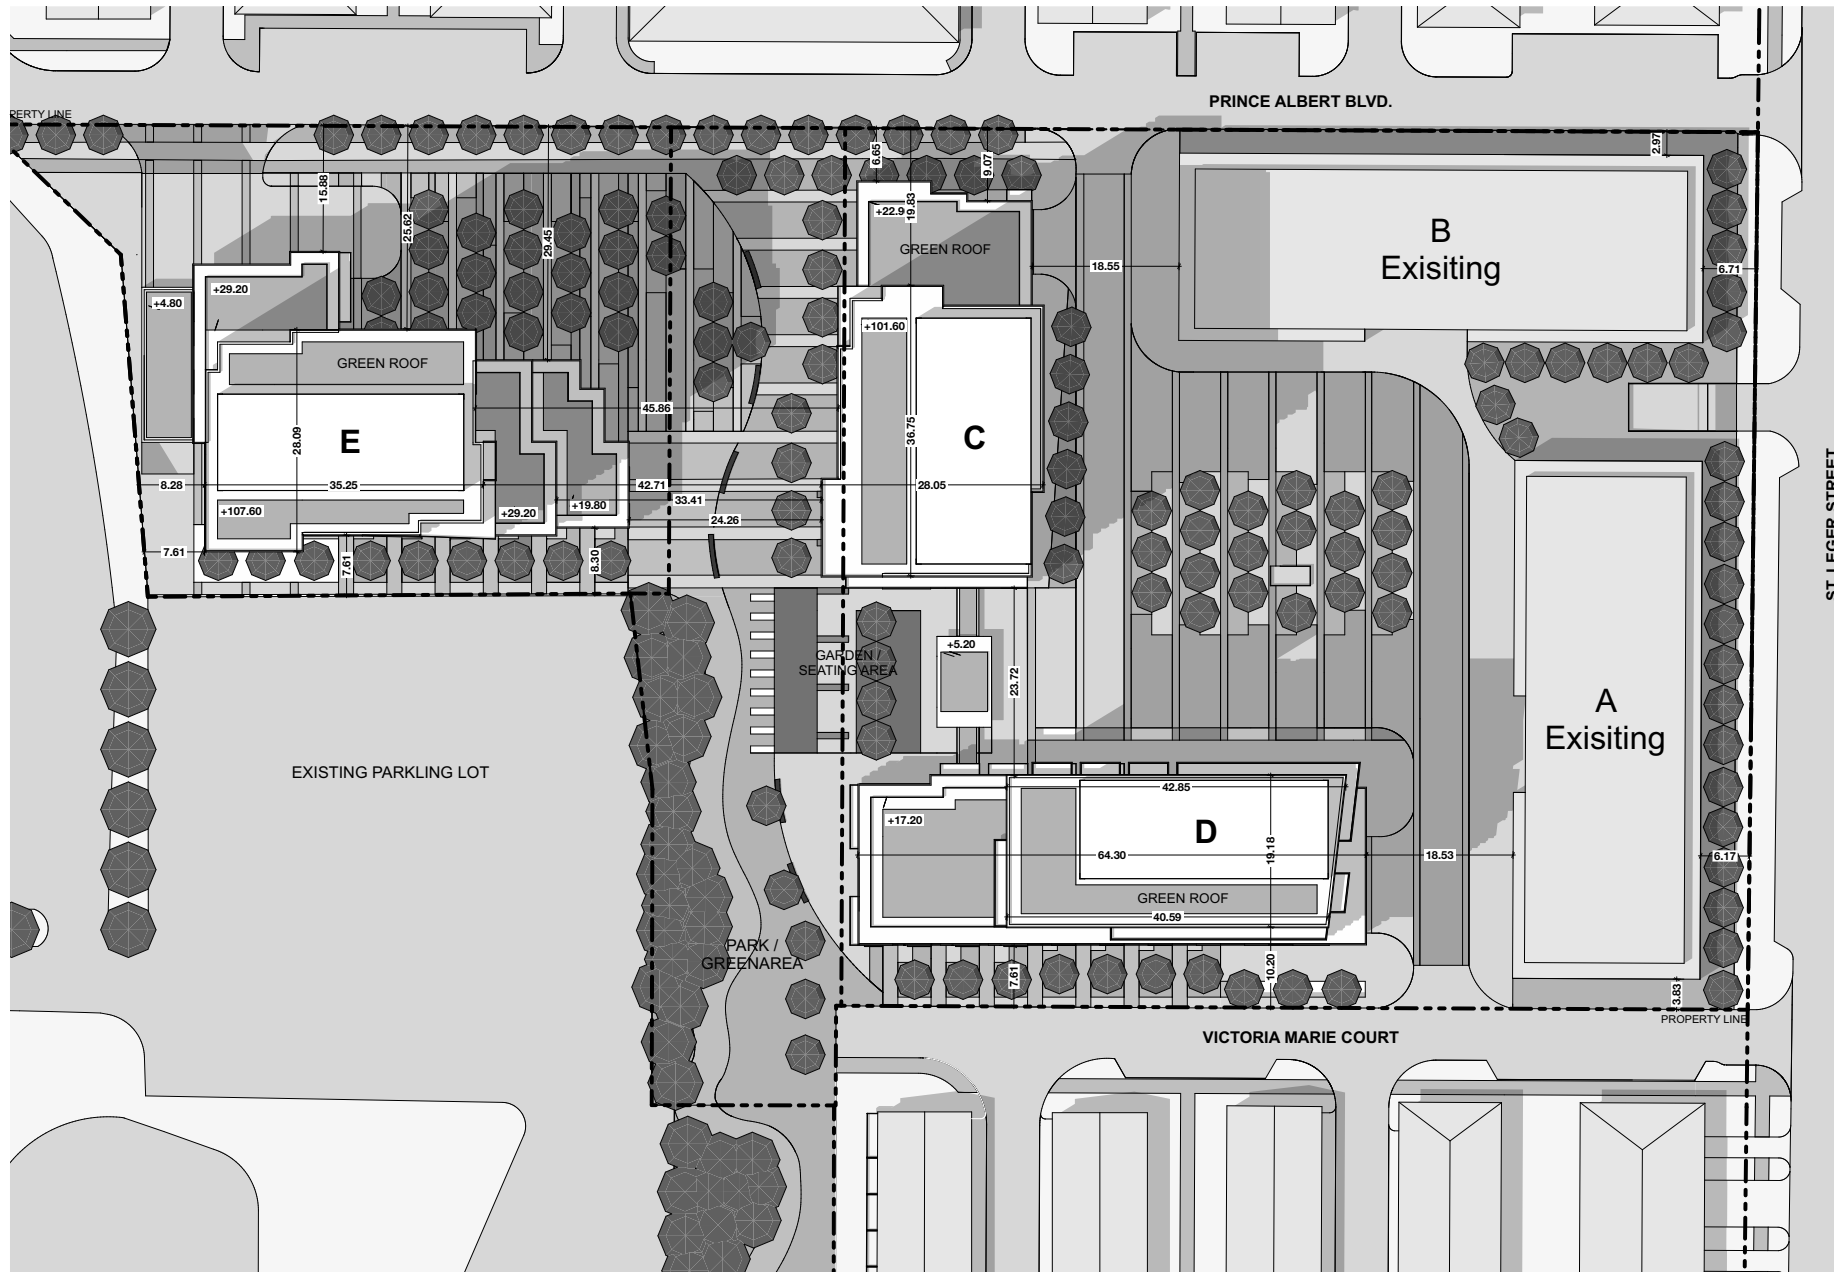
Proposed Site Plan showing three residential towers on mid-rise podiums (TACT Architecture, September 23, 2024)
